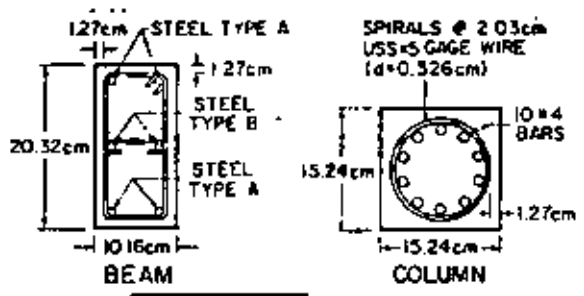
TEST SPECIMEN AND TESTING ARRANGEMENT
